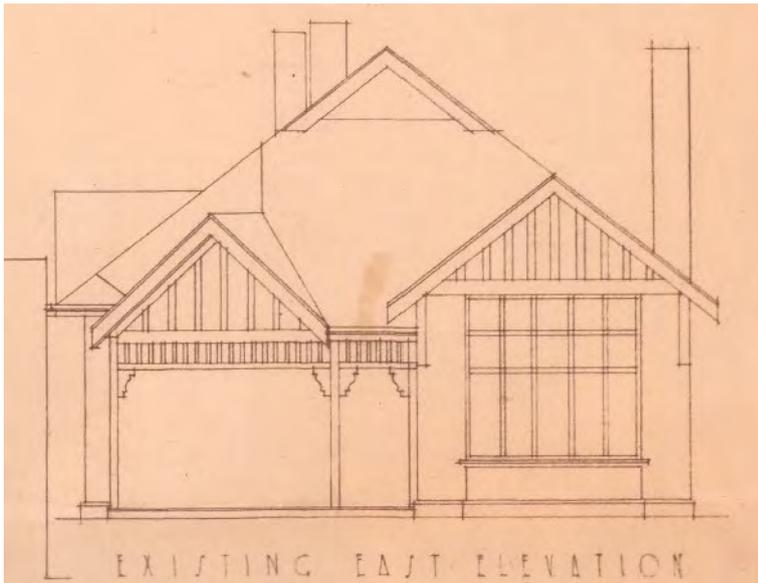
Front façade of the 1914 Federation house at 125 Westbury Street, which was later converted into flats. (Source: City of St Kilda Building Permit, No. 9916)
